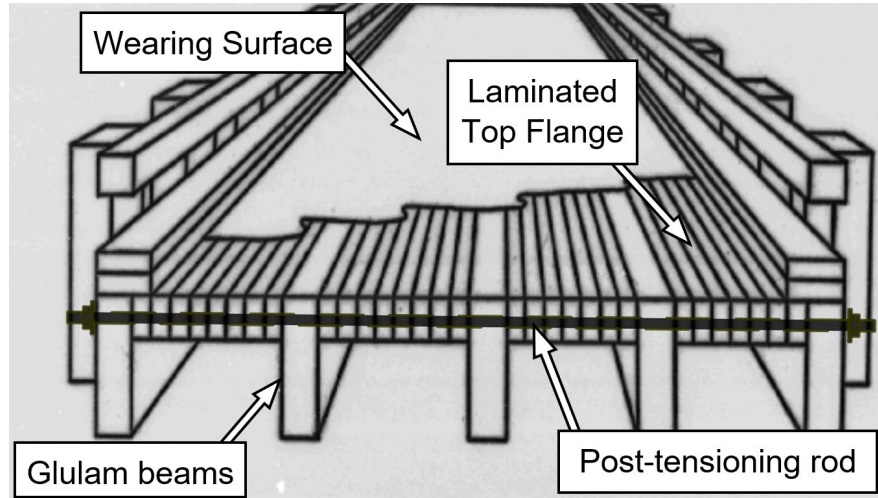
Typical Section of a Stress-Laminated Timber Tee Beam
